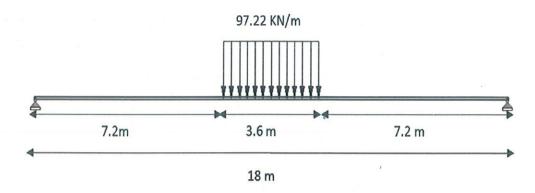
LIVE LOAD ON PLATE GIRDER.
